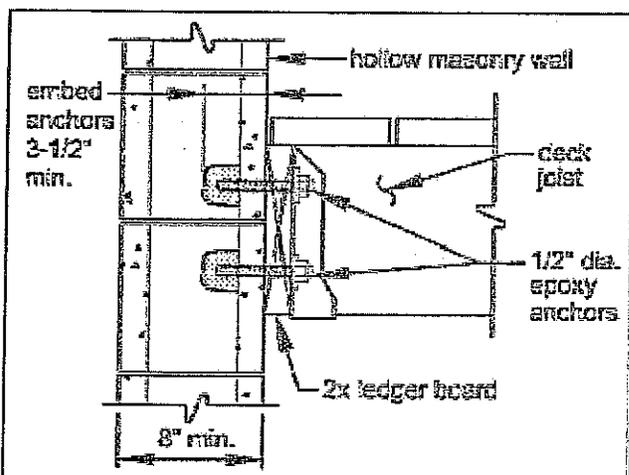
ATTACHMENT OF LEDGER BOARD-TO-FOUNDATION WALL (HOLLOW MASONRY)
